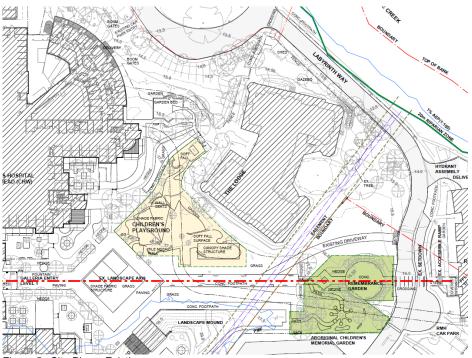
Site Plan – Existing Source: Billard Leece Partnership Architects
